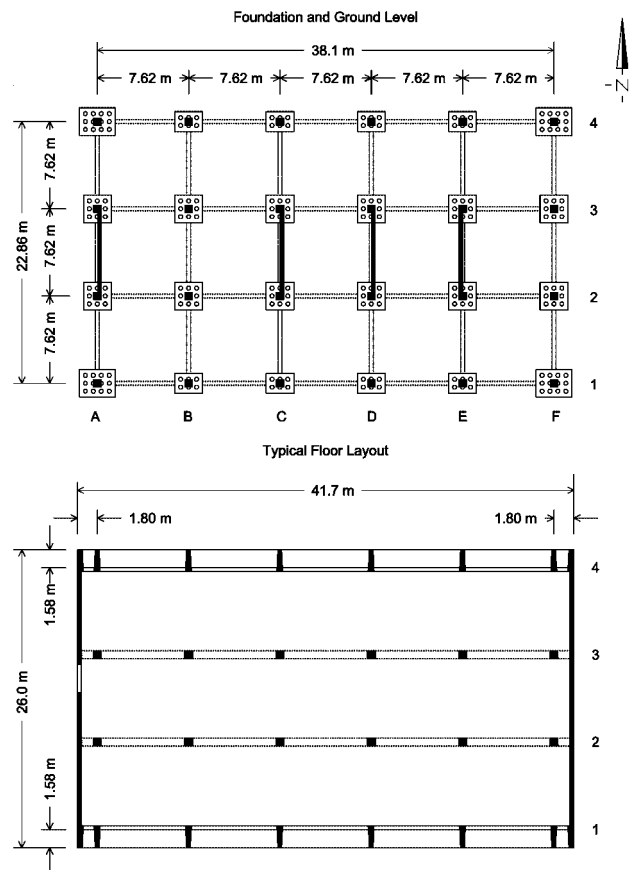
Foundation and ground level plan (top) and typical floor layout (bottom) of the ICS building.
